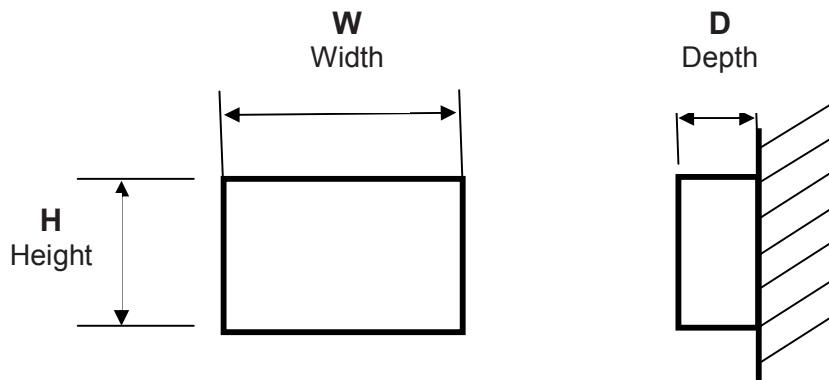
Dimensions of distribution wall box - Fibre splice wall boxes
